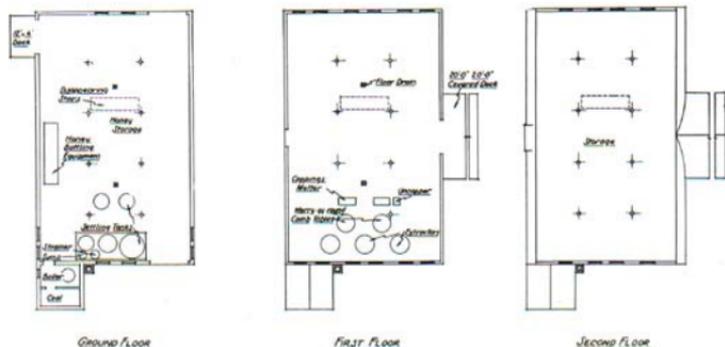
Floor plan for 36' x 60' Gothic type honey house.
